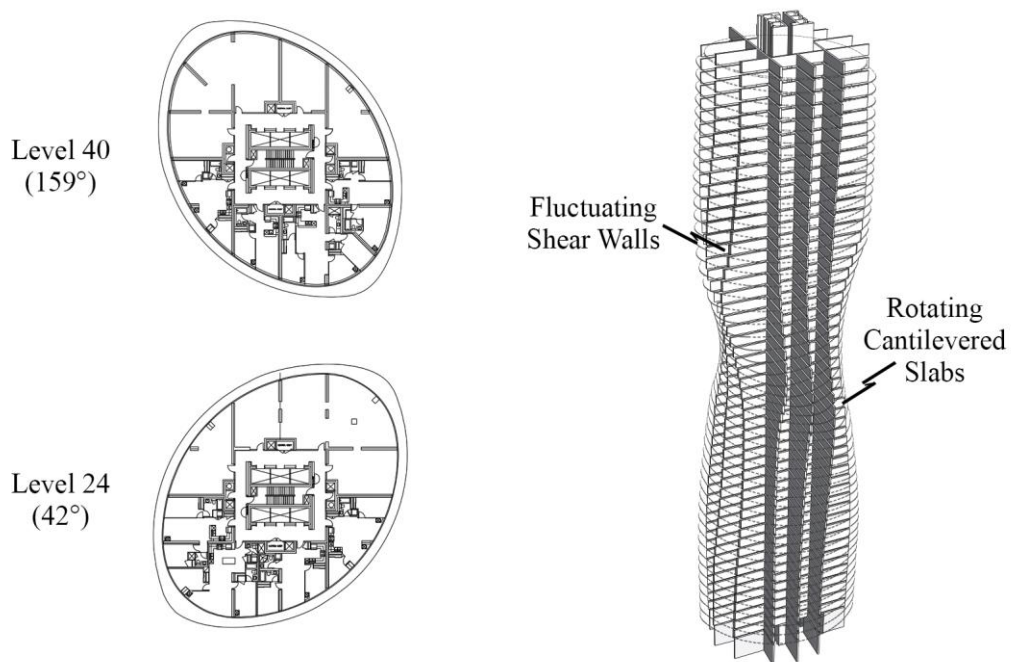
Absolute World Tower 56; floor plans of levels 24-40 (left panel) and 3D projection of structural system (right panel) (edited from Lagendijk et. al., 2012)
